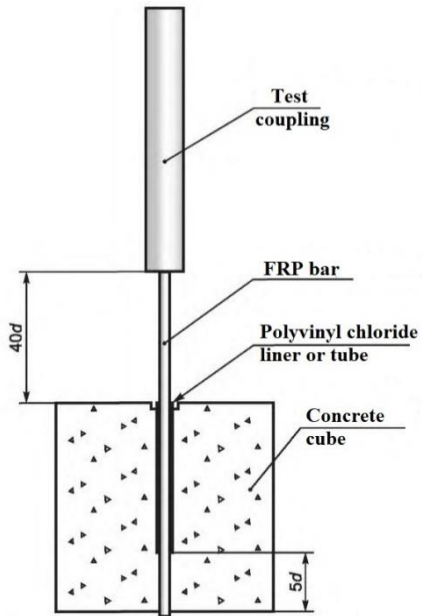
Setup diagram for embedding GFRP rebar in a concrete cube
